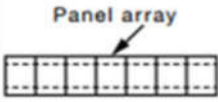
PANEL MOUNTED PARALLEL TO ROOF PLANE
